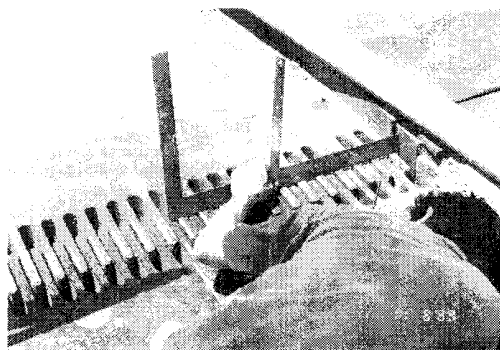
Comb joint as used in Ahmad Shah Bridge in Temerloh
